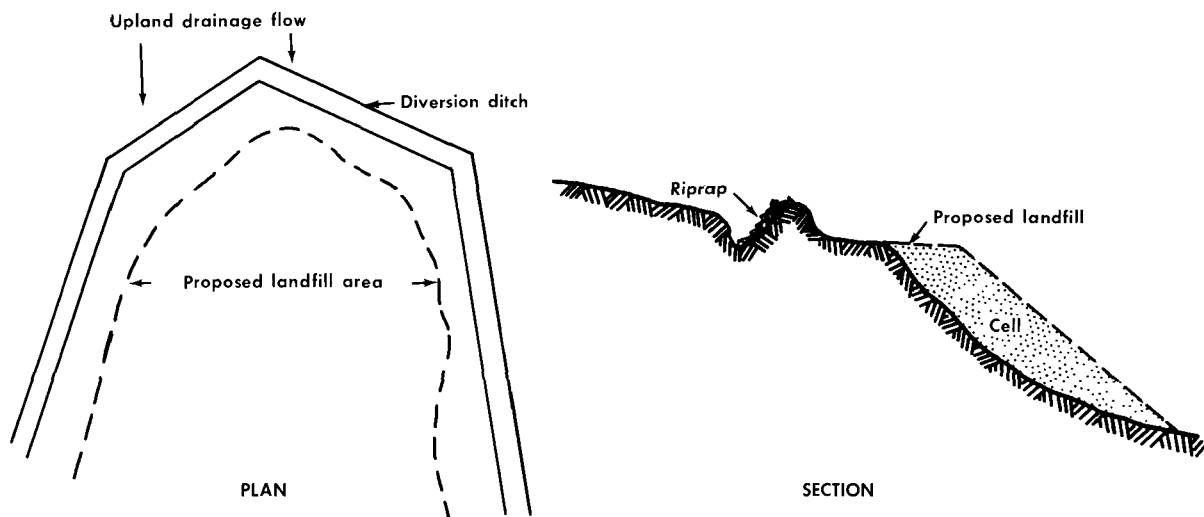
Plan and section views of the use of a diversion ditch to transmit upland drainage around a sanitary landfill.
